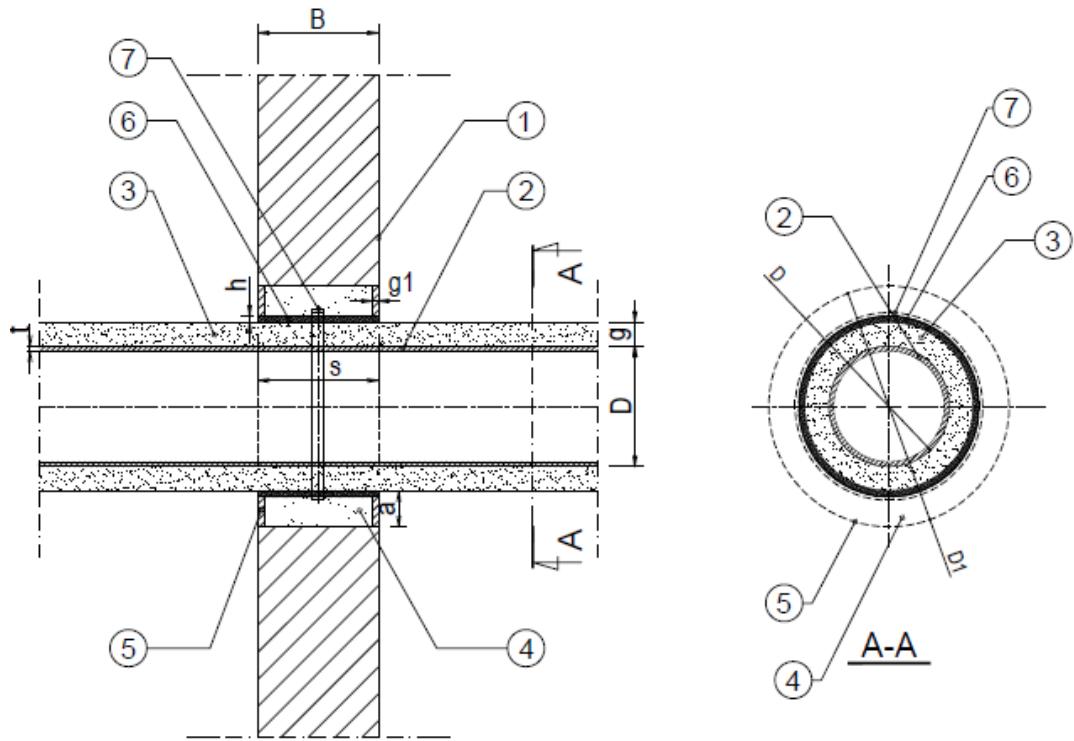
Plastic pipes penetration seals in flexible or rigid wall, made with use of PIRO Multitube PM (with PE foam insulation).
